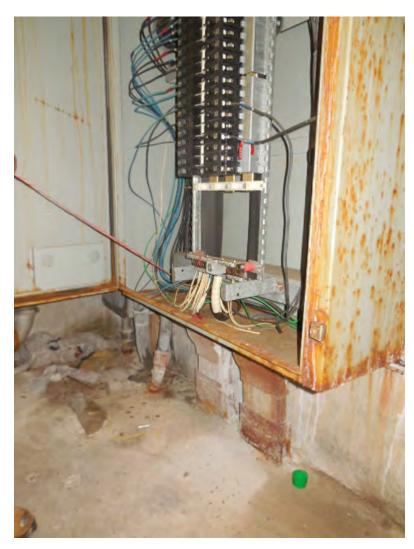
A13 Twinbrook – Pull string installation to AFC Panel
